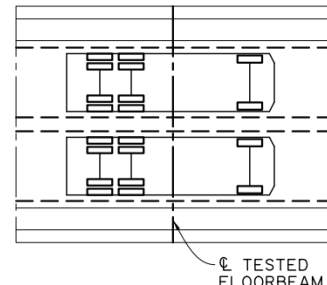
Plan View of Truck Positions for Floorbeam Cases
